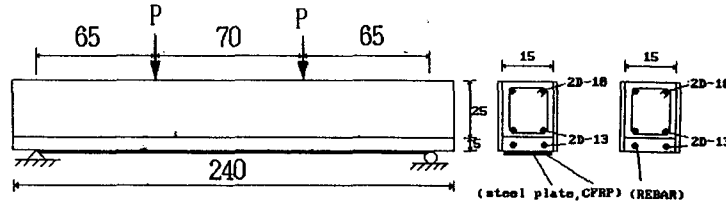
Strengthening Details and Loading Scheme (unit : cm)
